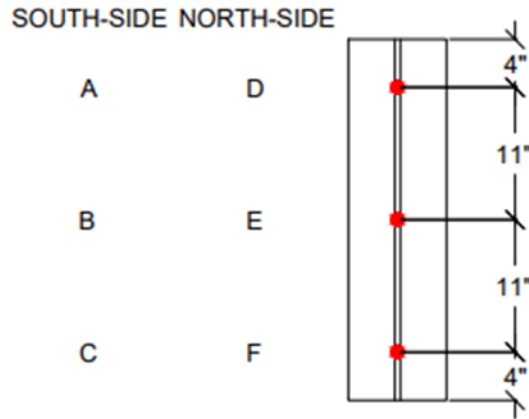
Sacrificial strain gauge plan for pile coupler steel sections.
